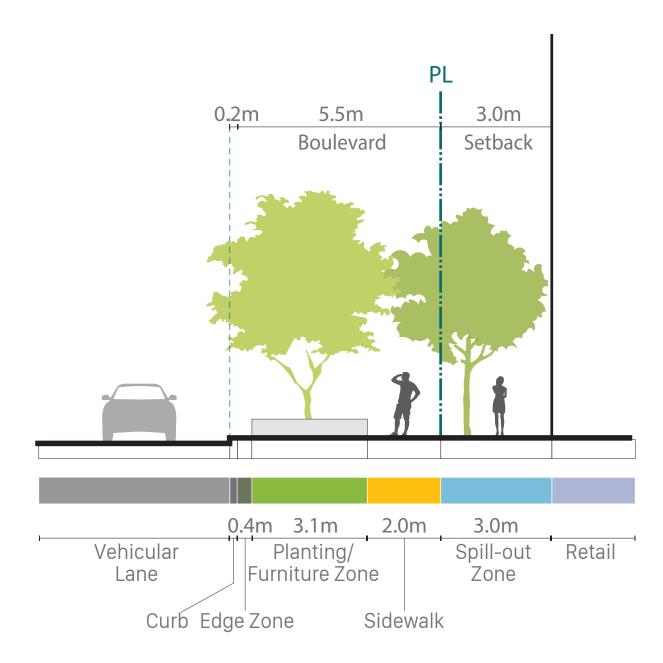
Section at interface of Retail on Subject Site and Clair Road East (Courtesy of SvN Architects + Planners)
